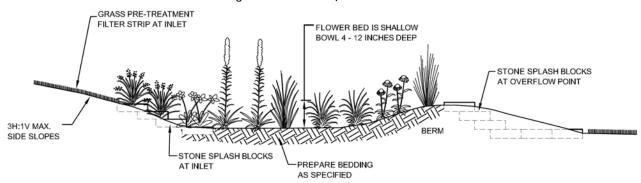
F. Rain garden typical cross-section with overflow splash blocks
